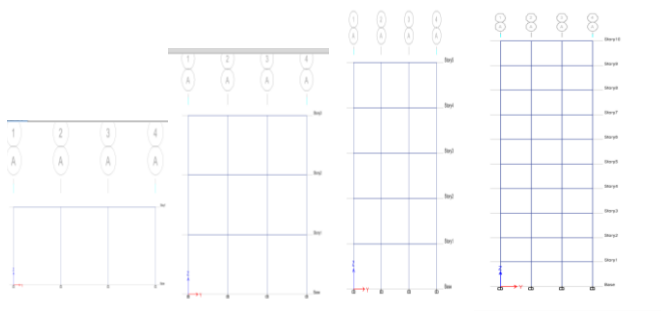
Shows models of Regular building without bracing 1, 3, 5 and 10 storeys structures.
